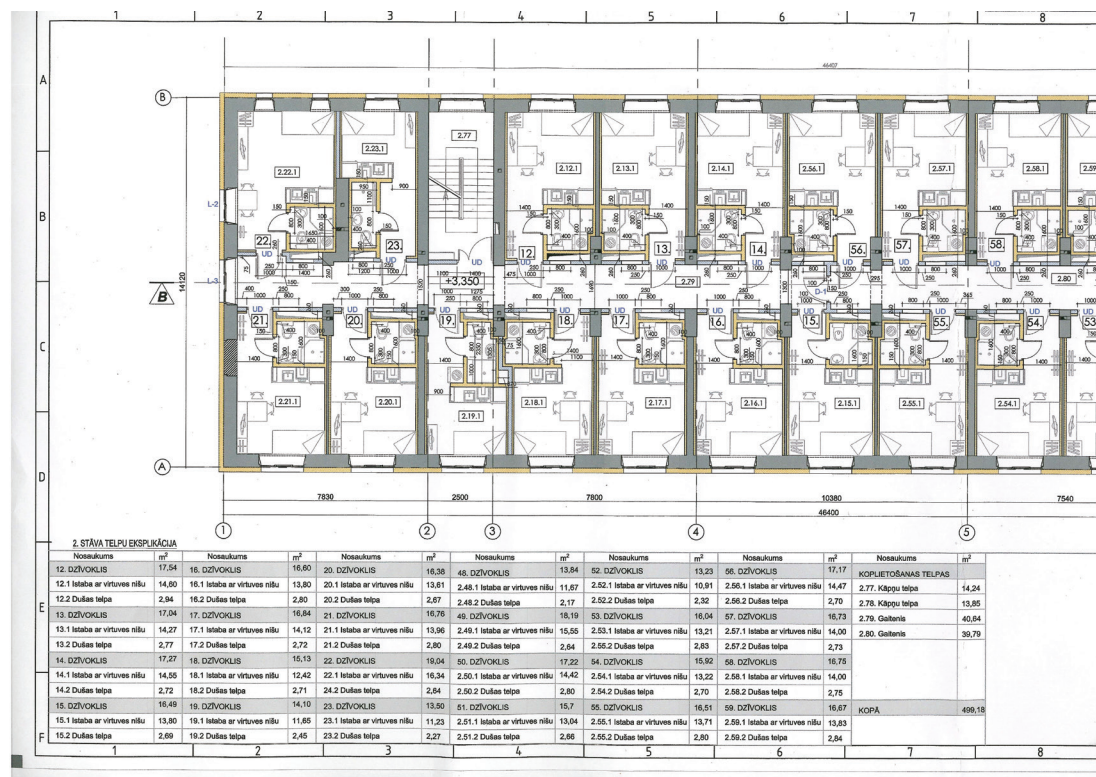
Floor plan of the municipality property reconstruction of social housing at Ieriku Street 28 (Riga: Līga Treija, n.d.)
